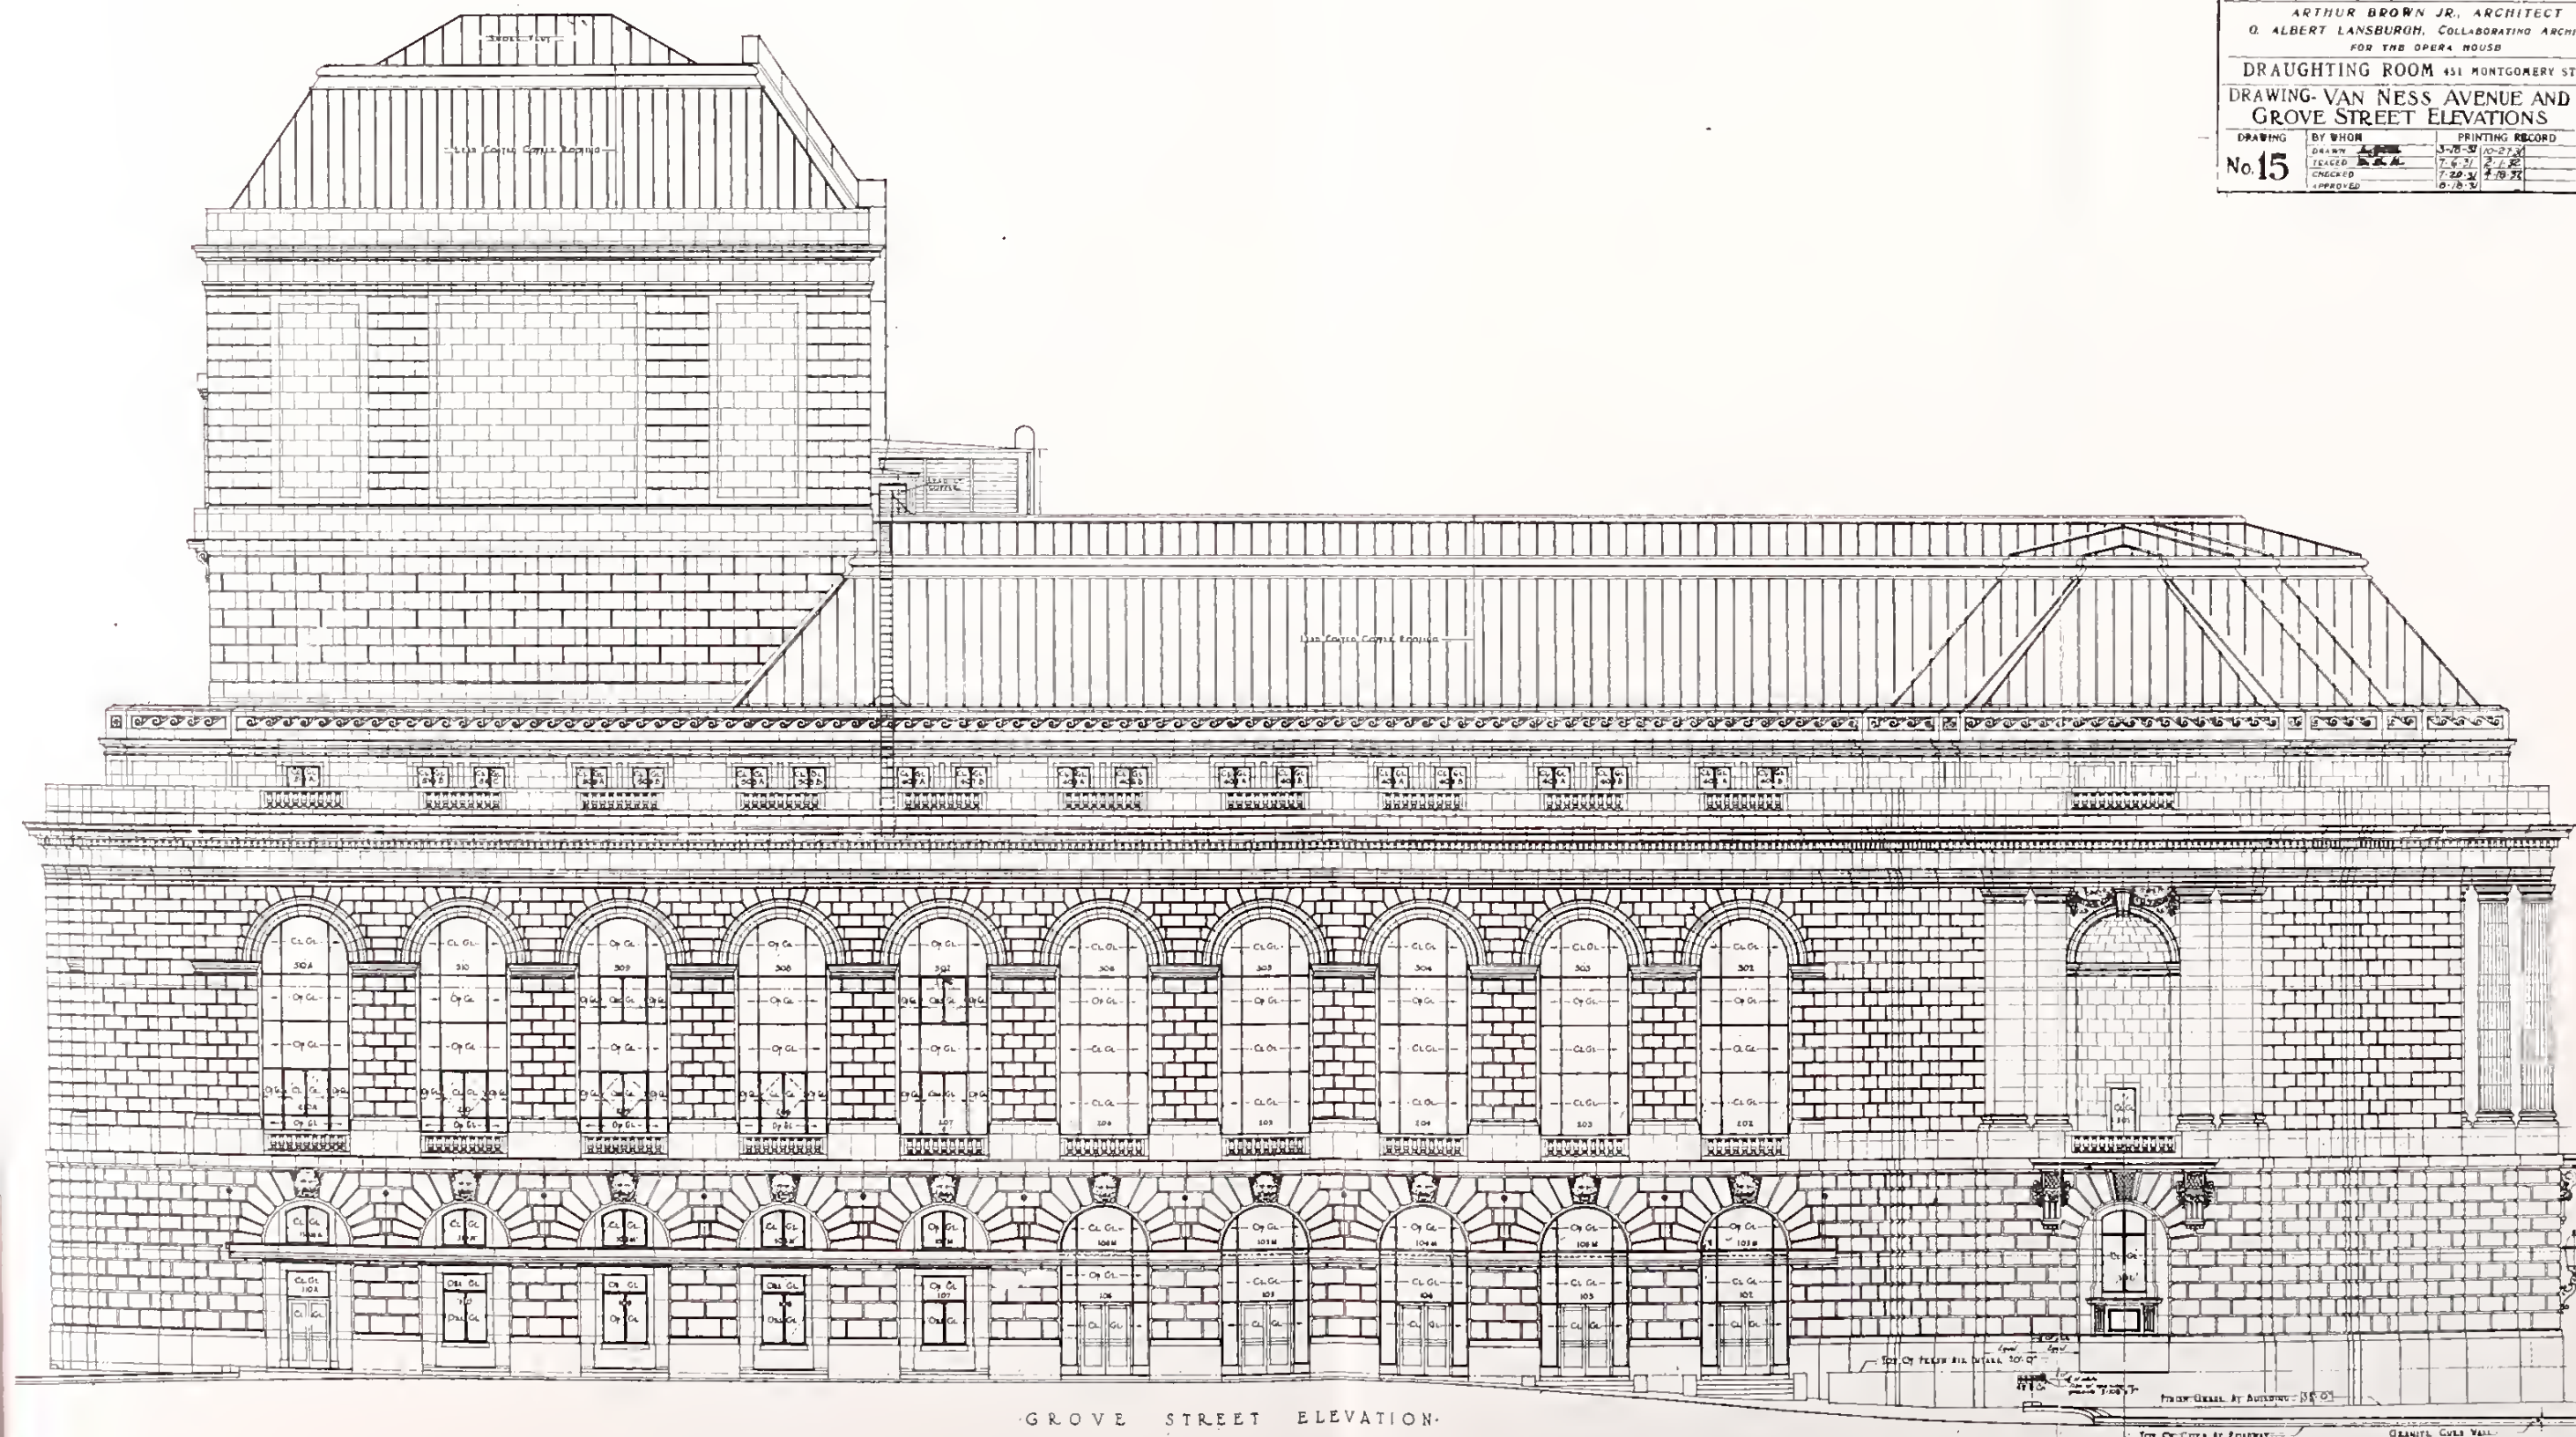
Grove Street Elevation; original drawing, 1932 (addition not shown)
